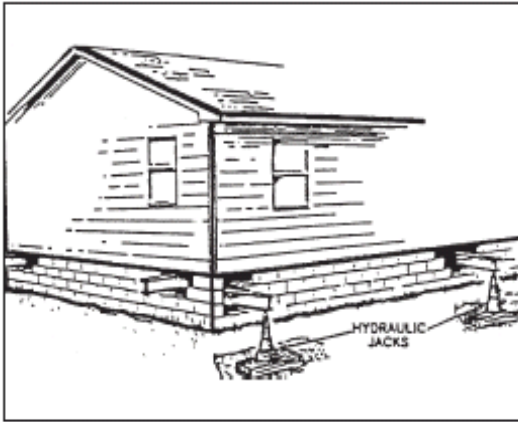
I-beams are placed under lifting points perpendicular to floor joists with a second set beneath for uniform lifting.
